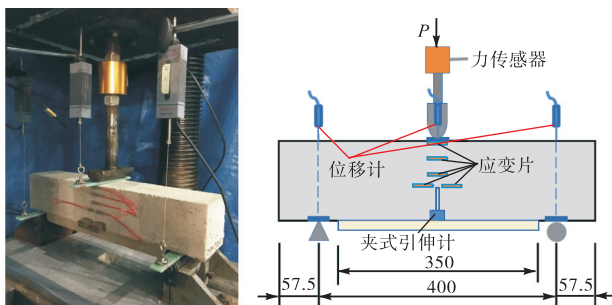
Schematic of beam specimen with pre-crack (unit: mm)
